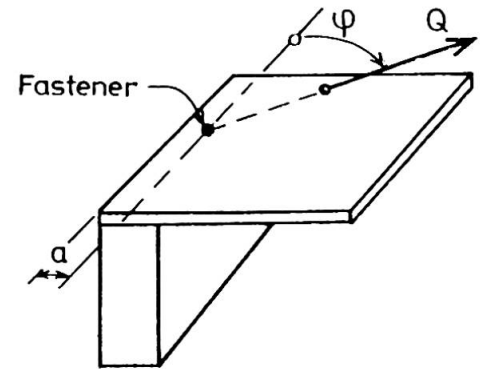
Loading test of mechanical fastener joining panel and lumber.
